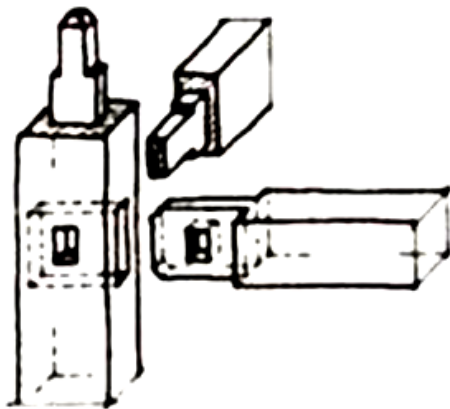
Schematic beam-to-column joint system of Joglo wooden house [8]
